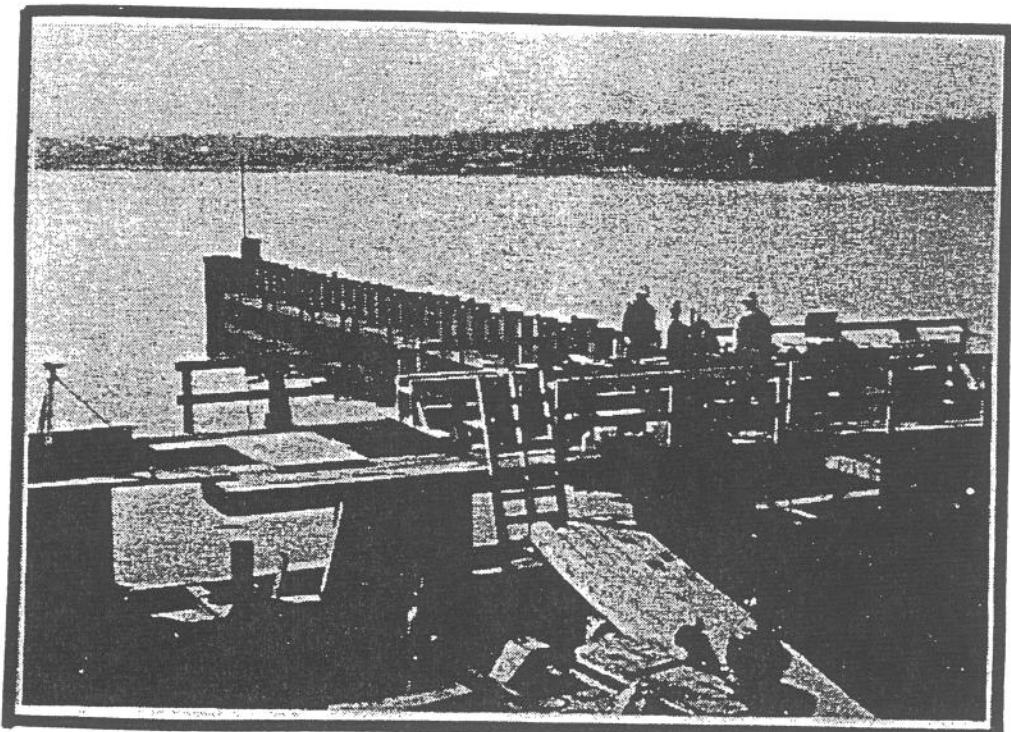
Work Platform and Load Test Reference Beam Set Up
